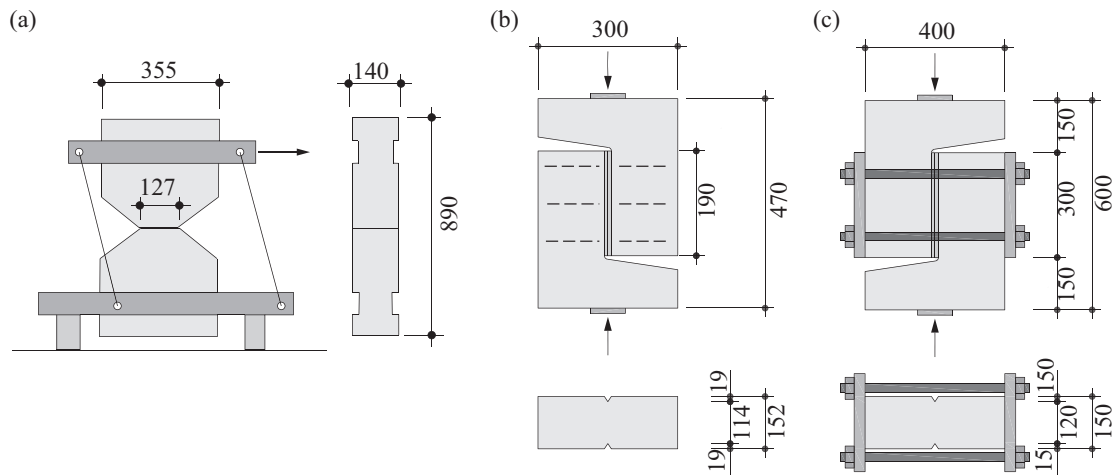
Test specimens used by: (a) Taylor [7]; (b) Paulay et al. [9]; (c) Walraven [13]
